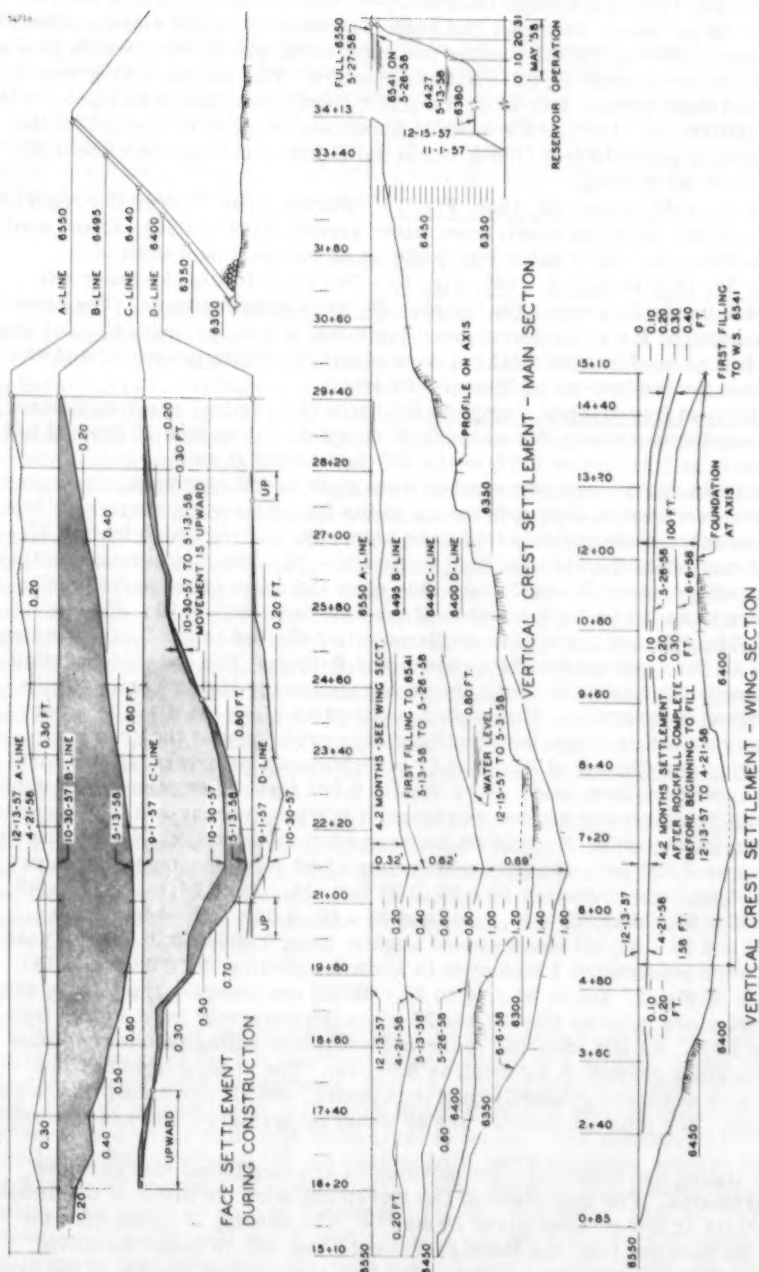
FACE SETTLEMENT DURING CONSTRUCTION - 1ST FILLING CREST SETTLEMENT - WISHON DAM
